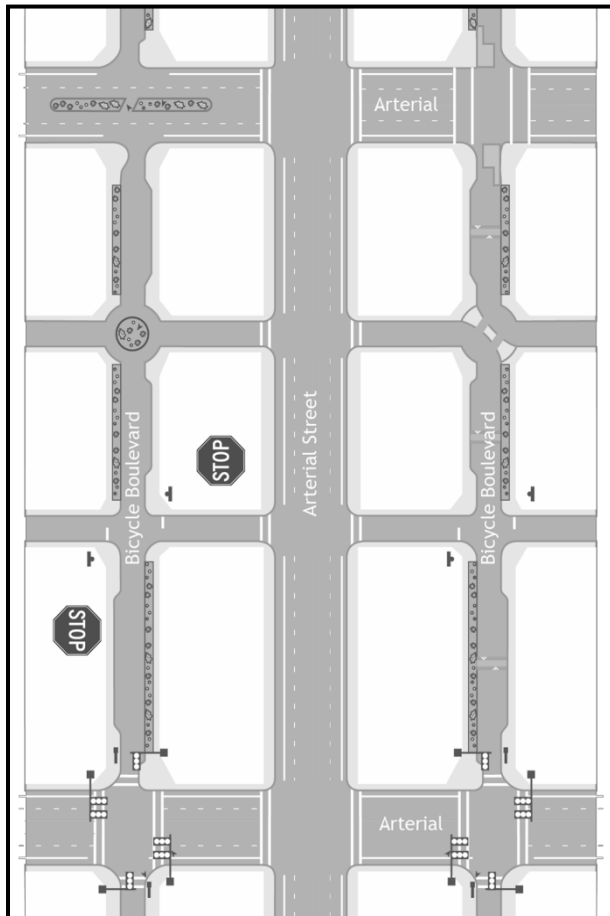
Neighbourhood Bikeway Plan View (Source: TAC GDGCR)
